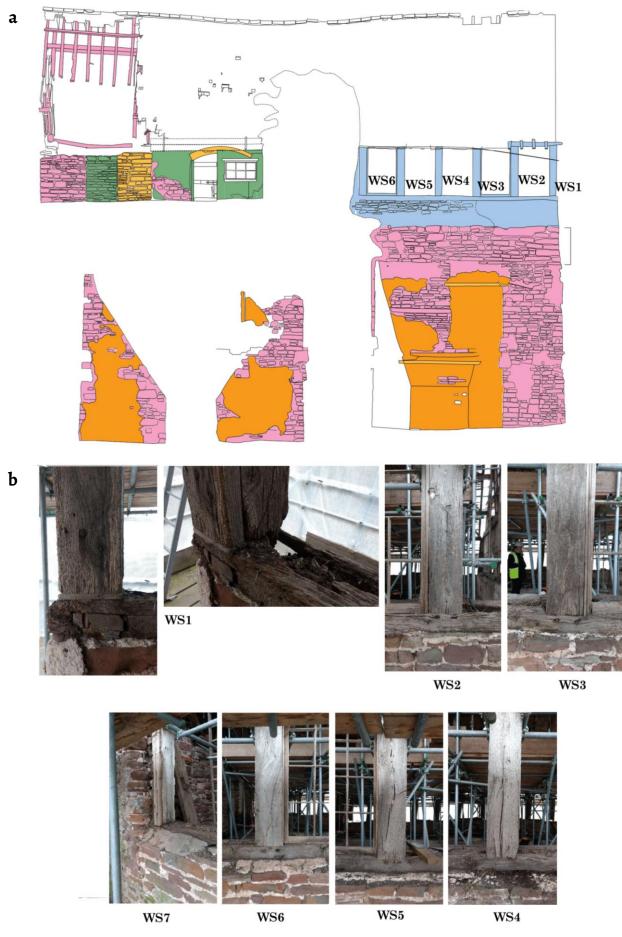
Detailed survey of the West elevation: *a*) Localization scheme of the West wall studs, and *b*) Individual stud details (2017).
